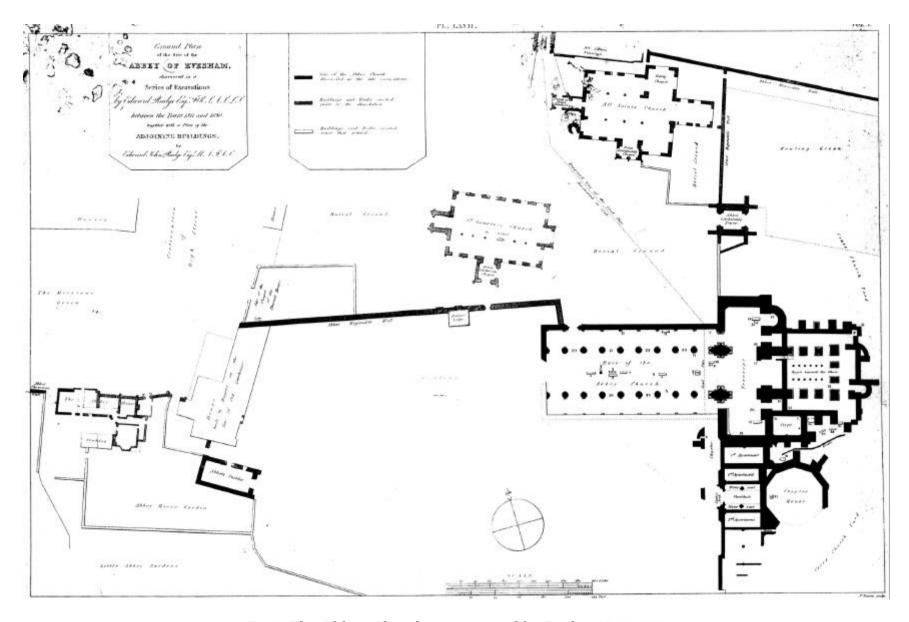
The Abbey Church as excavated by Rudge 1811-1830
